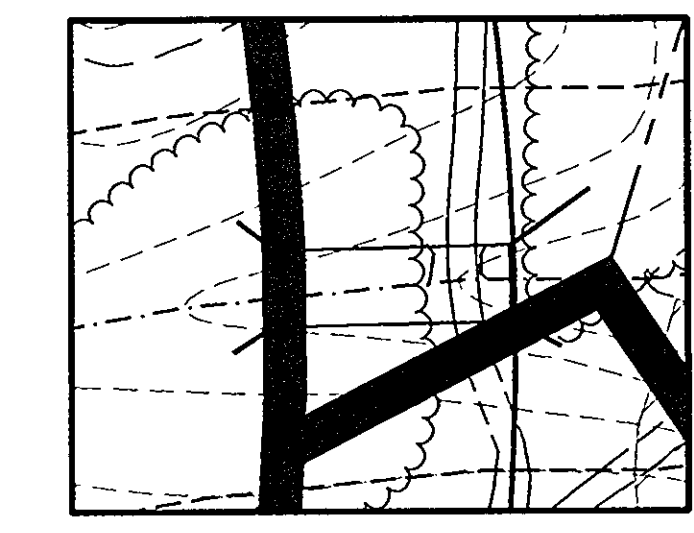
(POTENTIAL FUTURE CROSSING)
